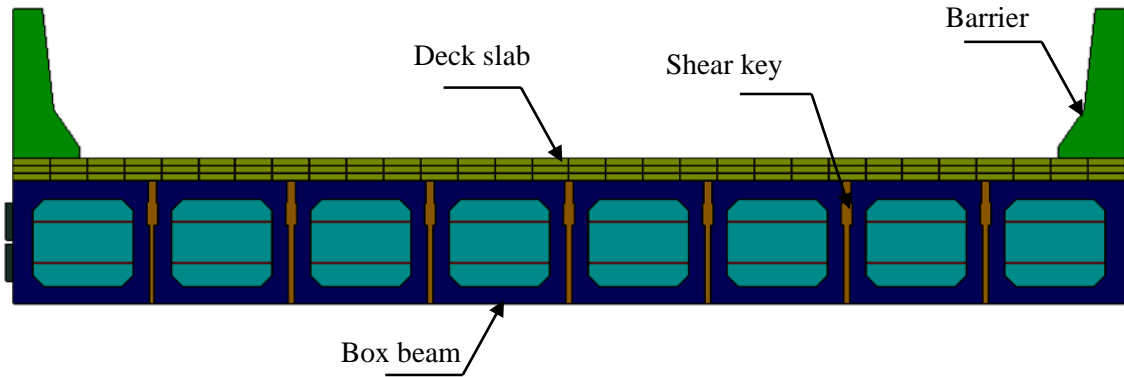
Typical cross section of side-by-side box beam bridges
